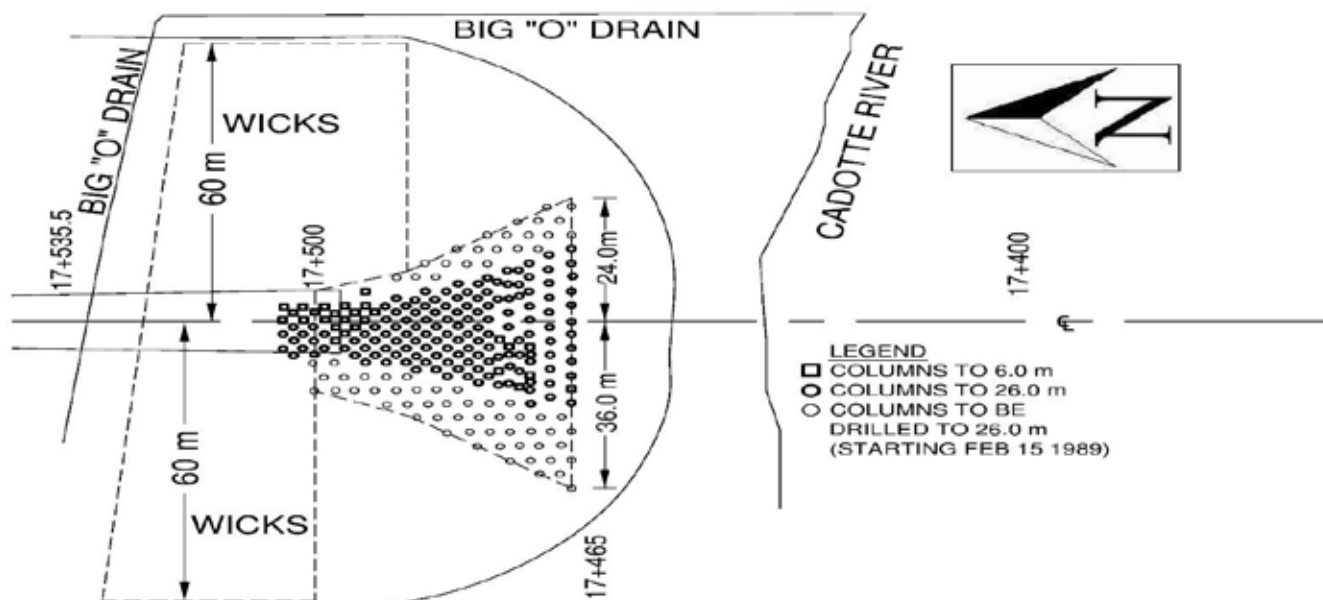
Layout of Stone columns and Wick Drains – North Approach ZONES
